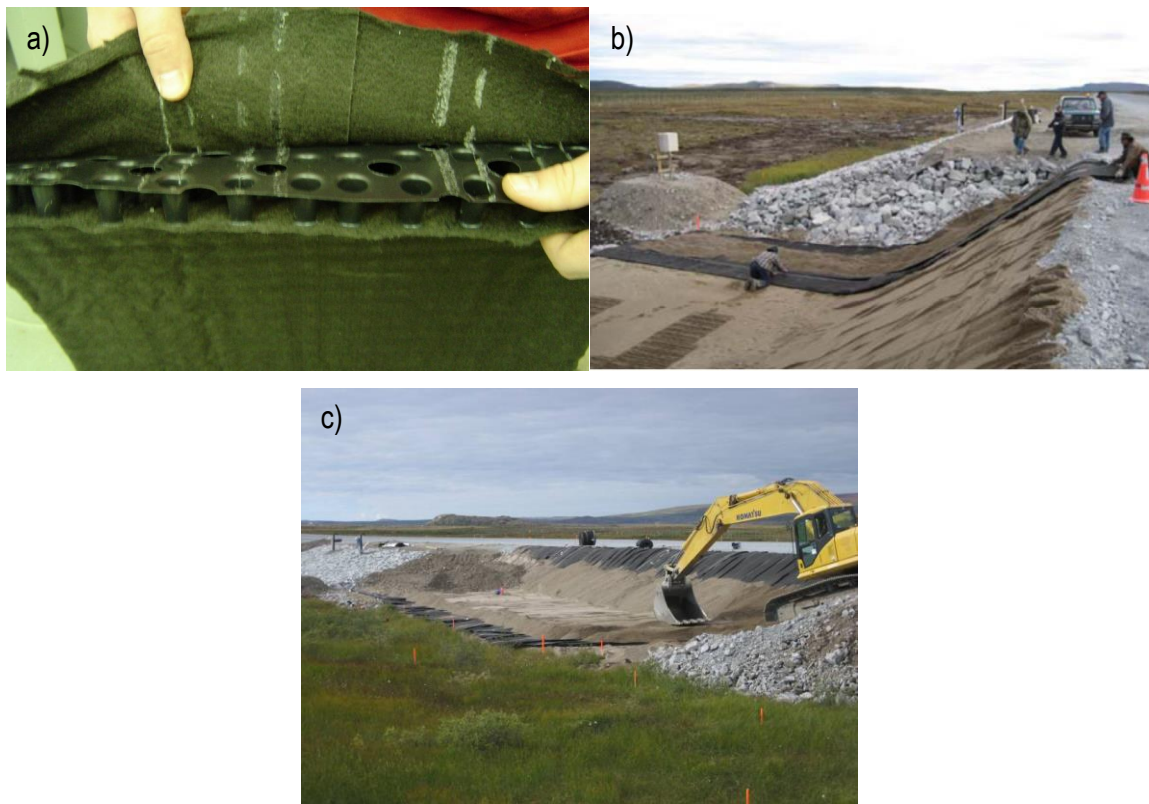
2: Heat drain installed at Tasiujaq airstrip, Northern Quebec, Canada. (a) heat drain; (b) during the installation; (c) layers of sand under and above.
